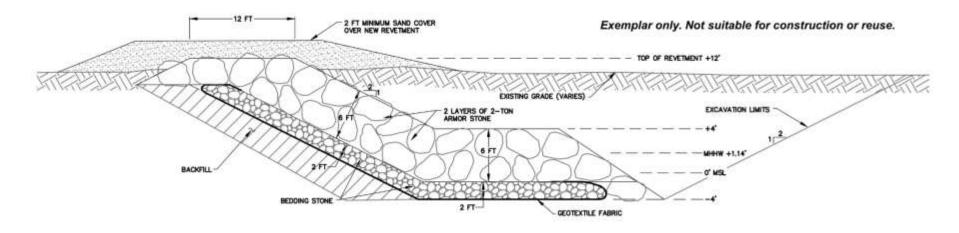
Sample cross-section of buried revetment and dune restoration (Boudreau et al. 2018).
